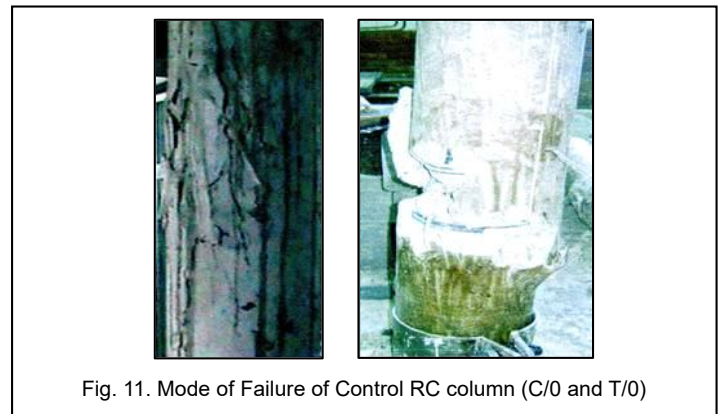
Mode of Failure of Control RC column (C/0 and T/0)
